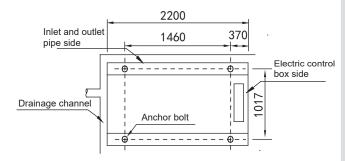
Top view of schematic diagram of installation dimension of 110KW
